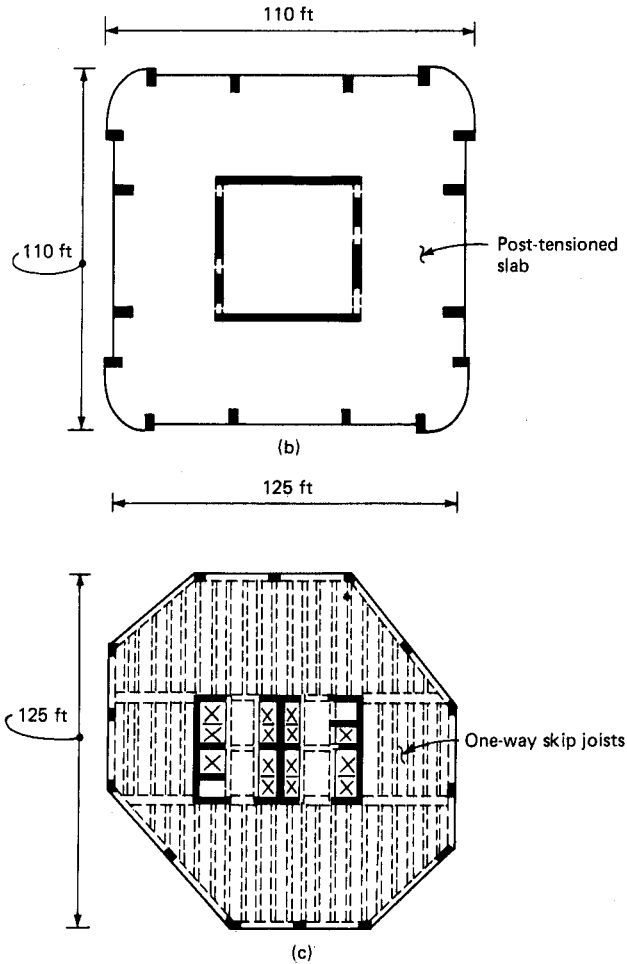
(Continued) (b) Shear walls with posttensioned flat plate; (c) shear walls with one-way joist system.
